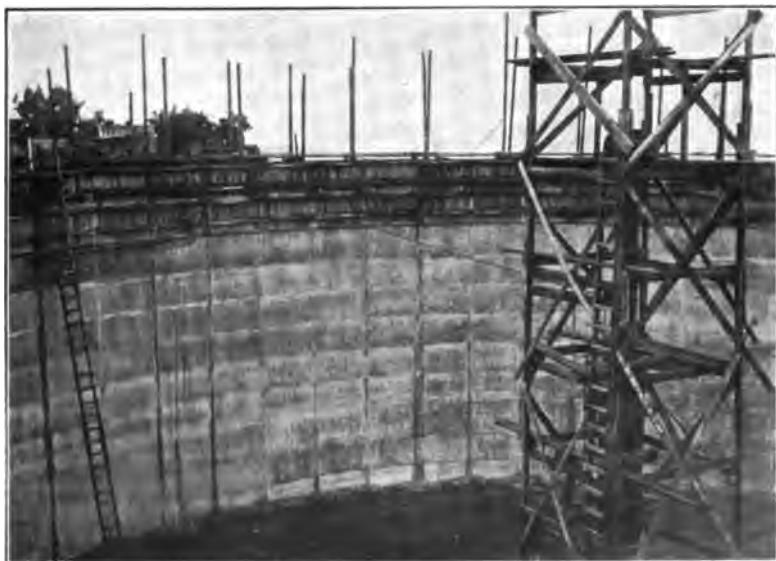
INTERIOR OF WALL DURING CONSTRUCTION.
